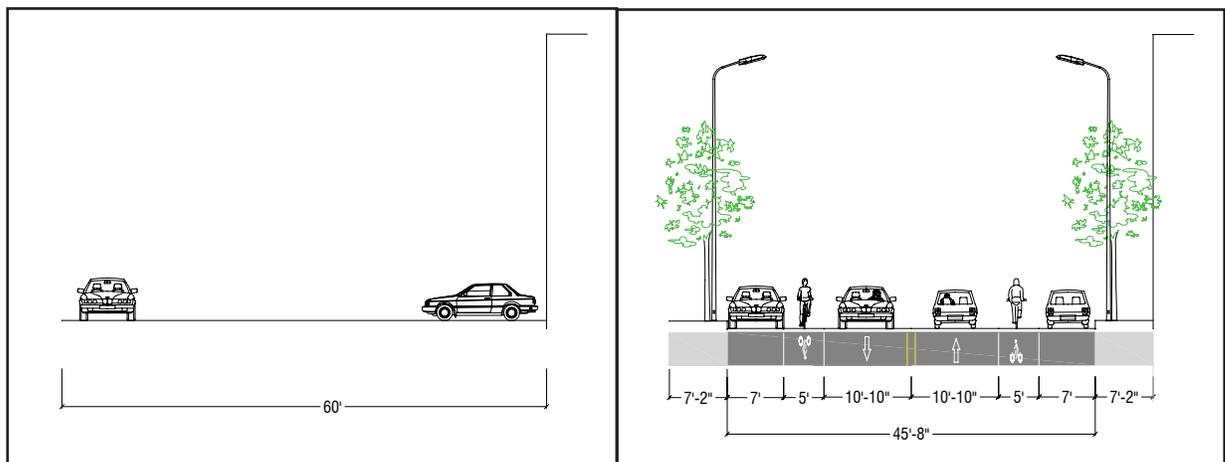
East 132nd Street between Alexander Avenue and Willis Avenue, existing and recommended cross section (facing west)
